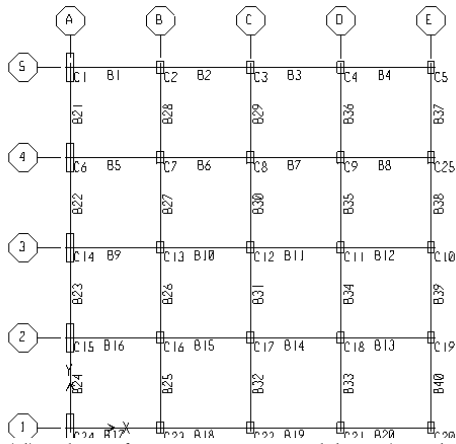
(d): Plan of Asymmetric Building (Model IV)
